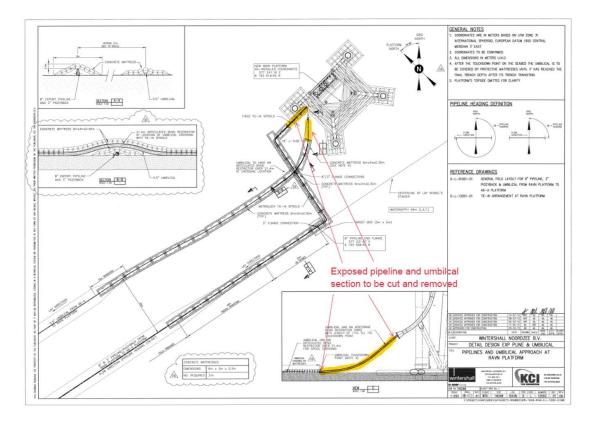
8-inch/3-inch pipeline bundle and umbilical sections to be cut and removed at Ravn Platform.
